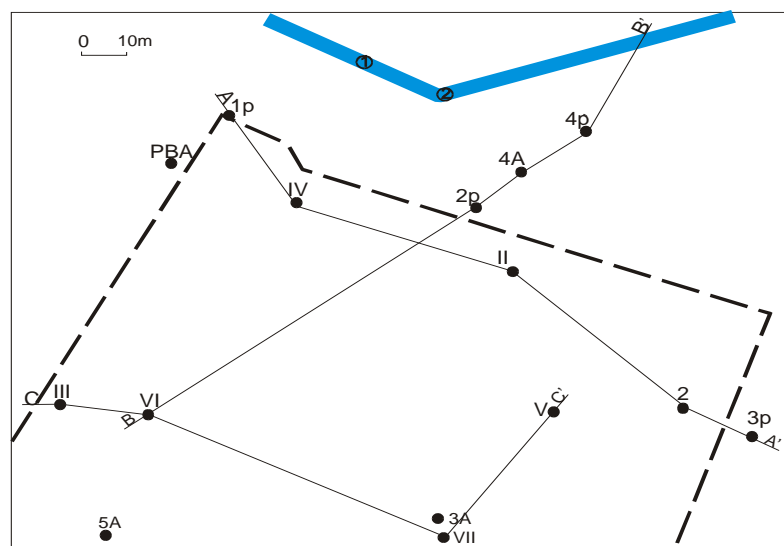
Site plan of waste dump „Chrobów” and lines of geological cross-section.
